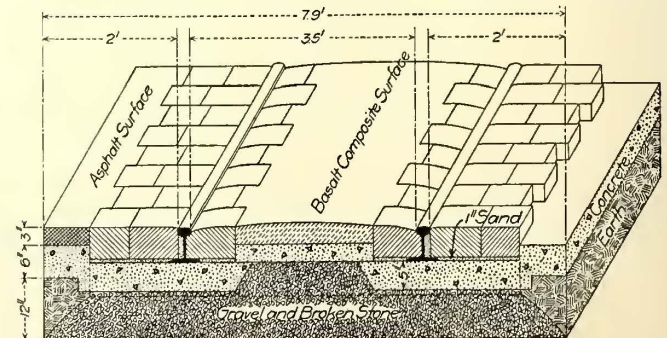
Denver City Tramway Company—Standard T-Rail Construction in Paved Streets
